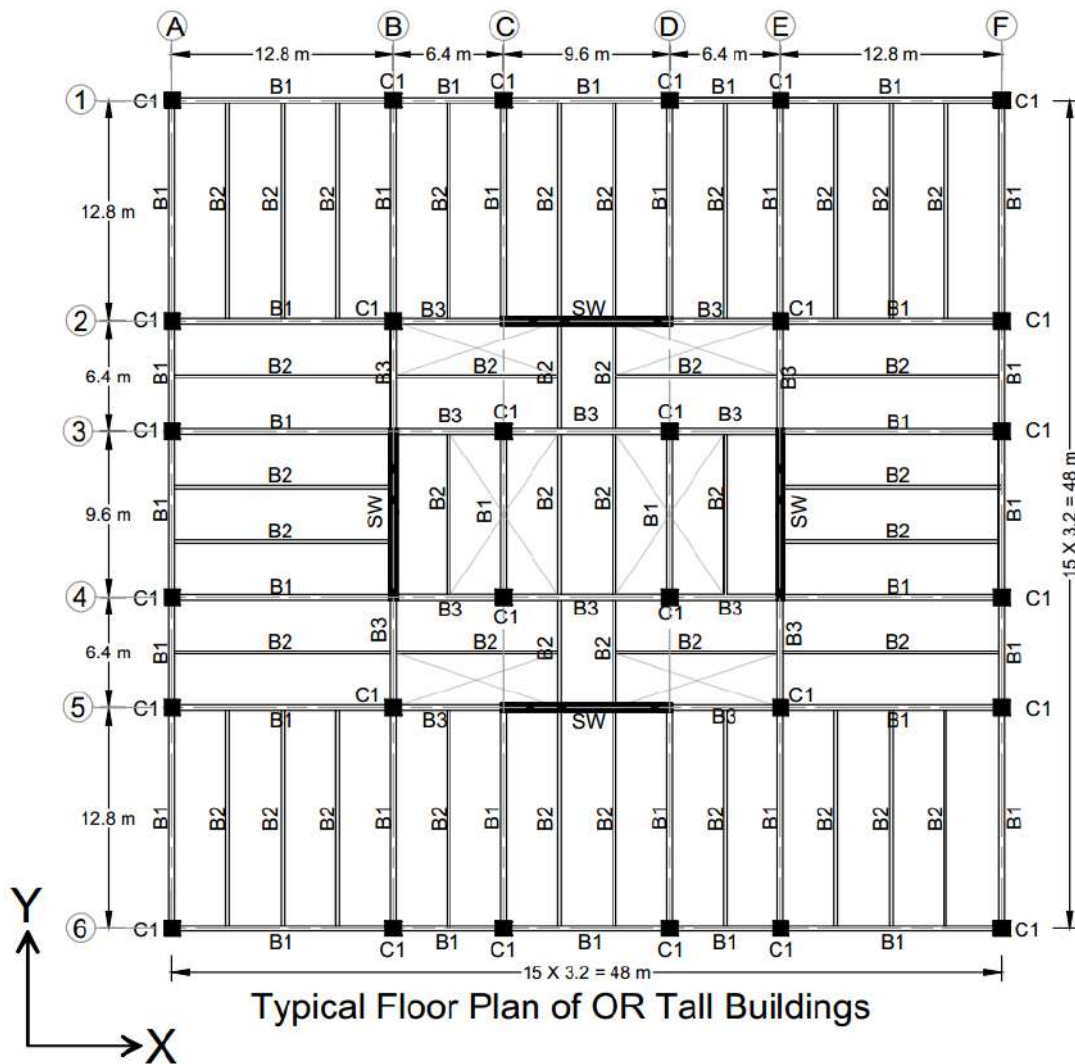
Typical Floor Plan of OR Tall Buildings
